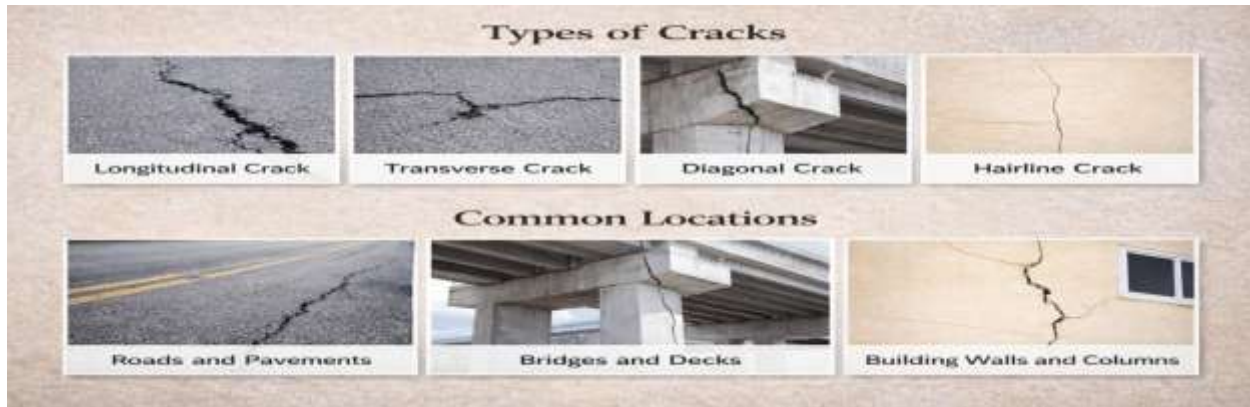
Representative crack morphologies and common locations in civil infrastructure (roads/pavements, bridges/decks, and building walls/columns)
